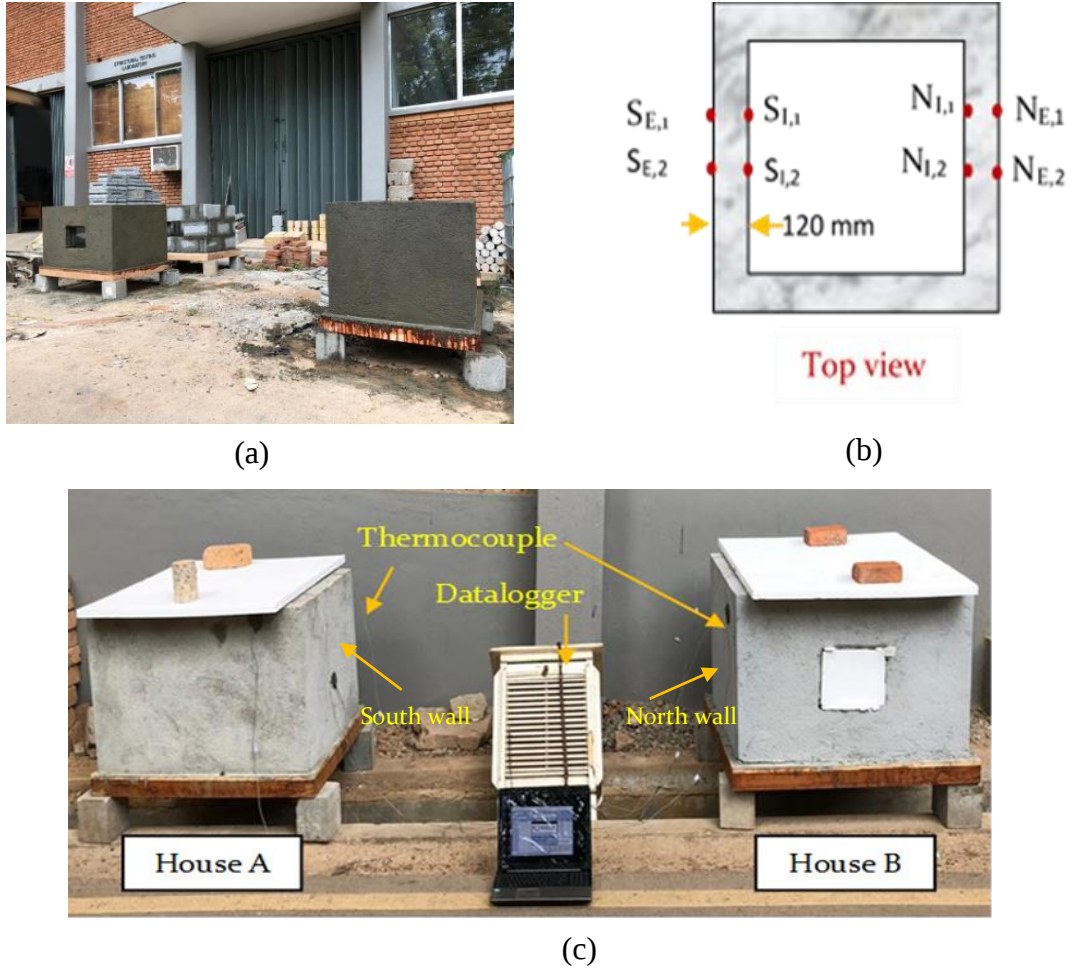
Test setup: (a) Test house construction; (b) location of thermocouples; and (c) test setup
